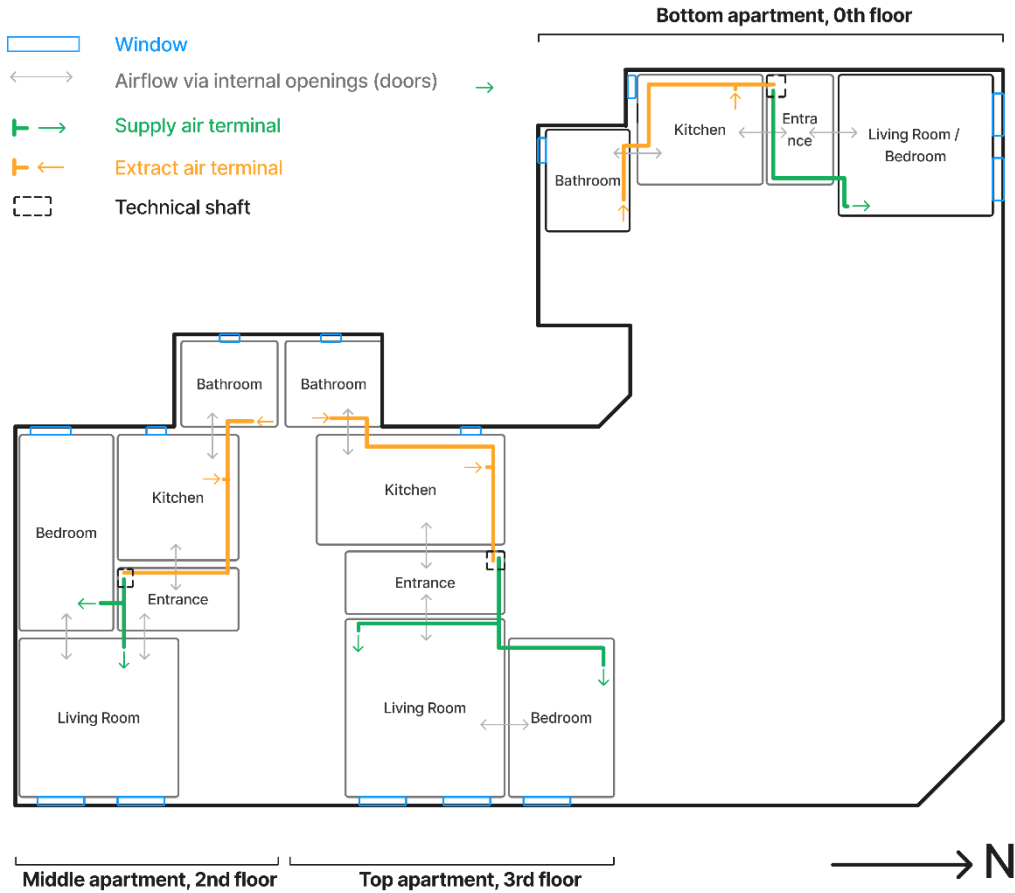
CV ventilation system. Proposed placement of airflow terminals, supply, and extract ducts.
